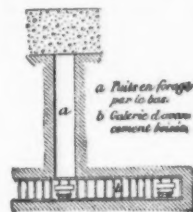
DETAILS OF SHAFTS AND ADITS.
